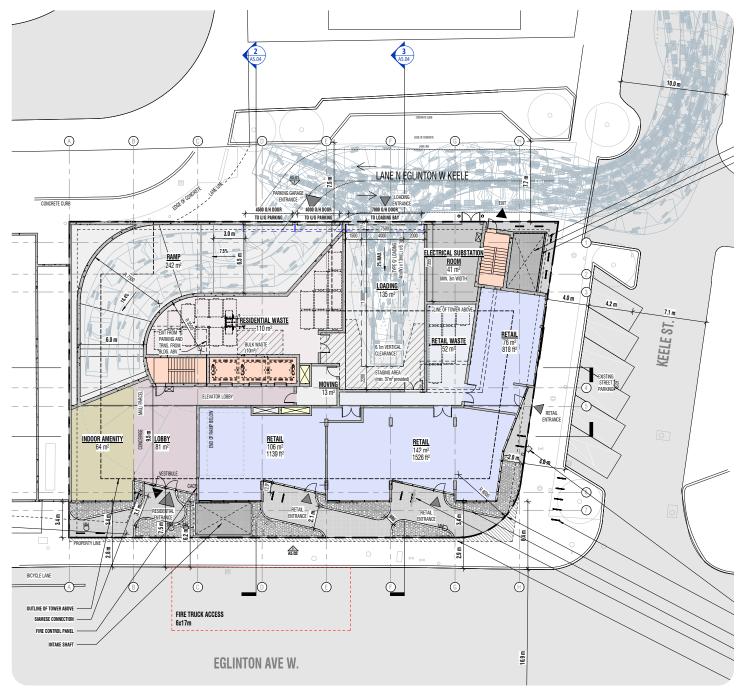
Site Plan (Prepared by gh3 Inc.)
